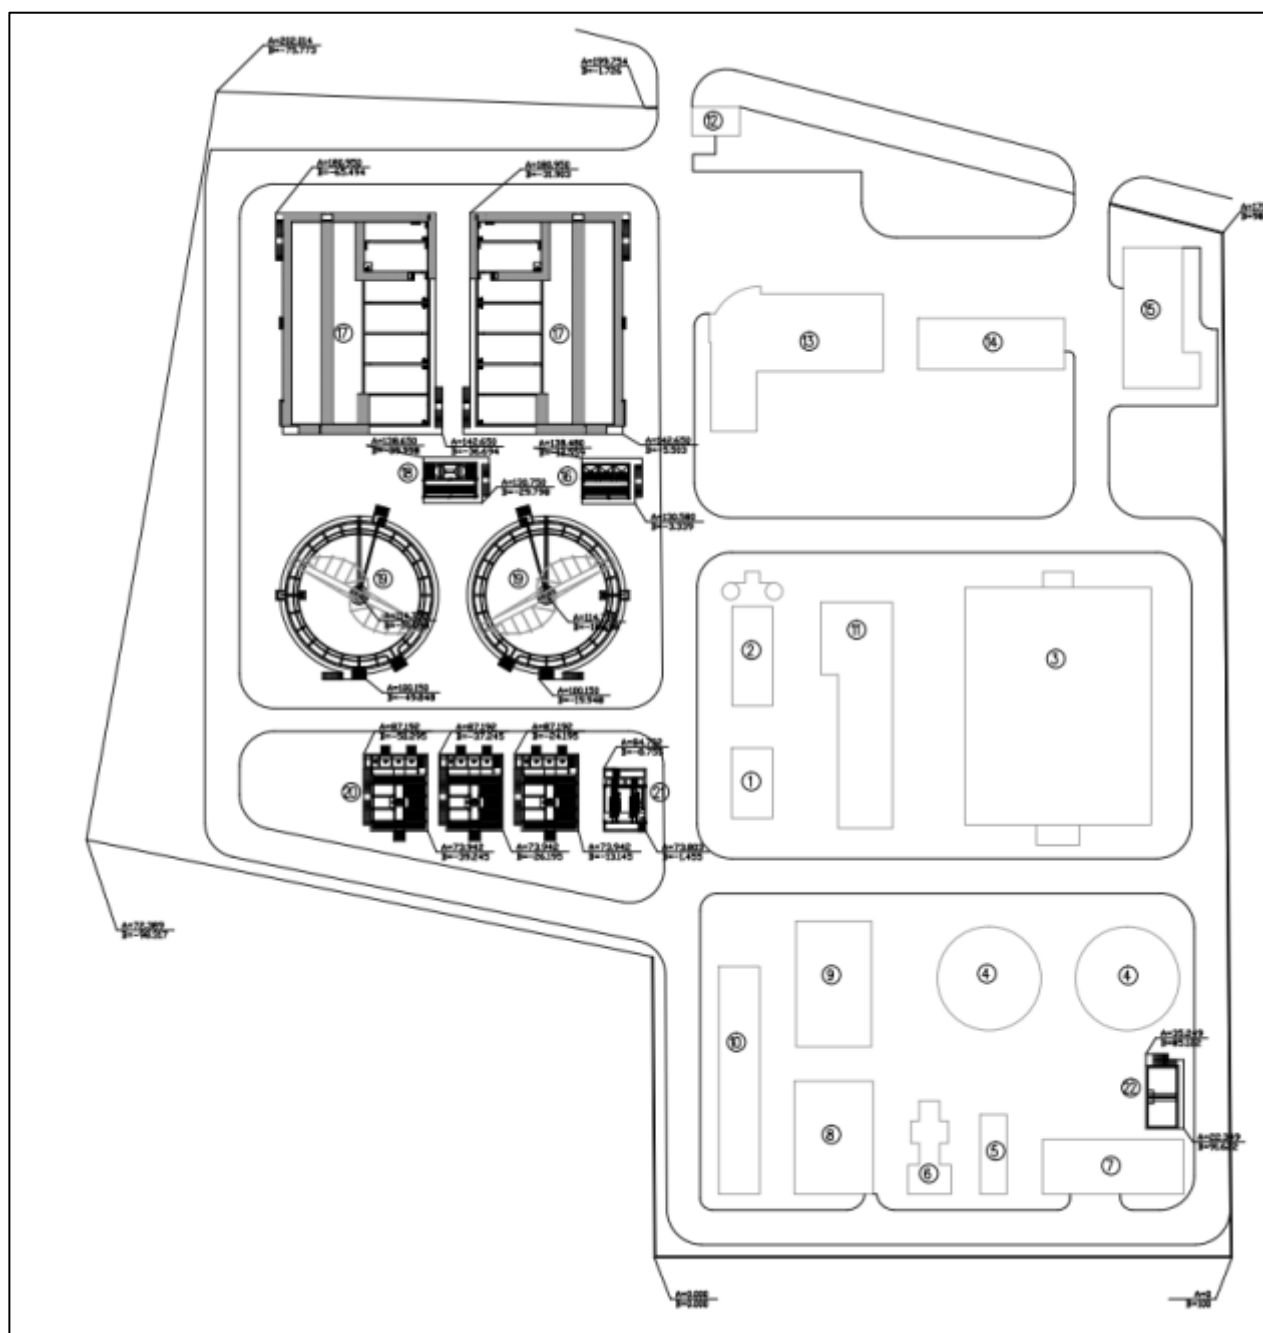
Zuoquan WWTP Expansion Project Layout
